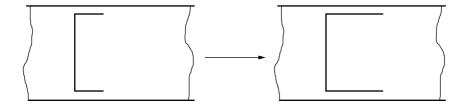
a) — Cross-section dimension of stiffening elements — Increase
